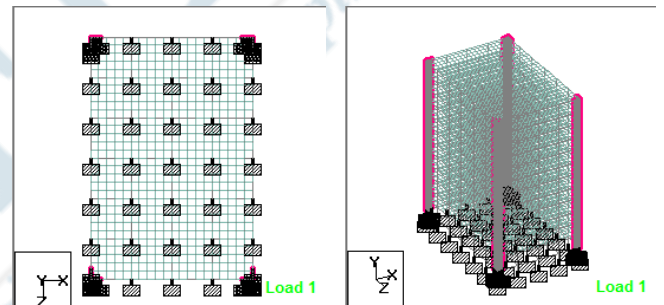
Typical Plan and 3D view of External Shear Wall at Corners (ESXZ4C)
